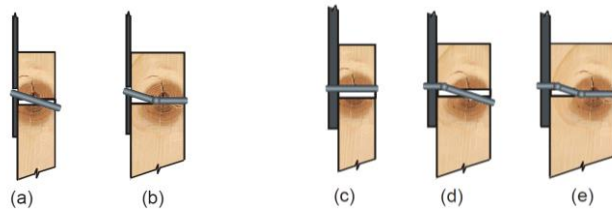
Failure modes for timber-steel connections according to EC5-1
